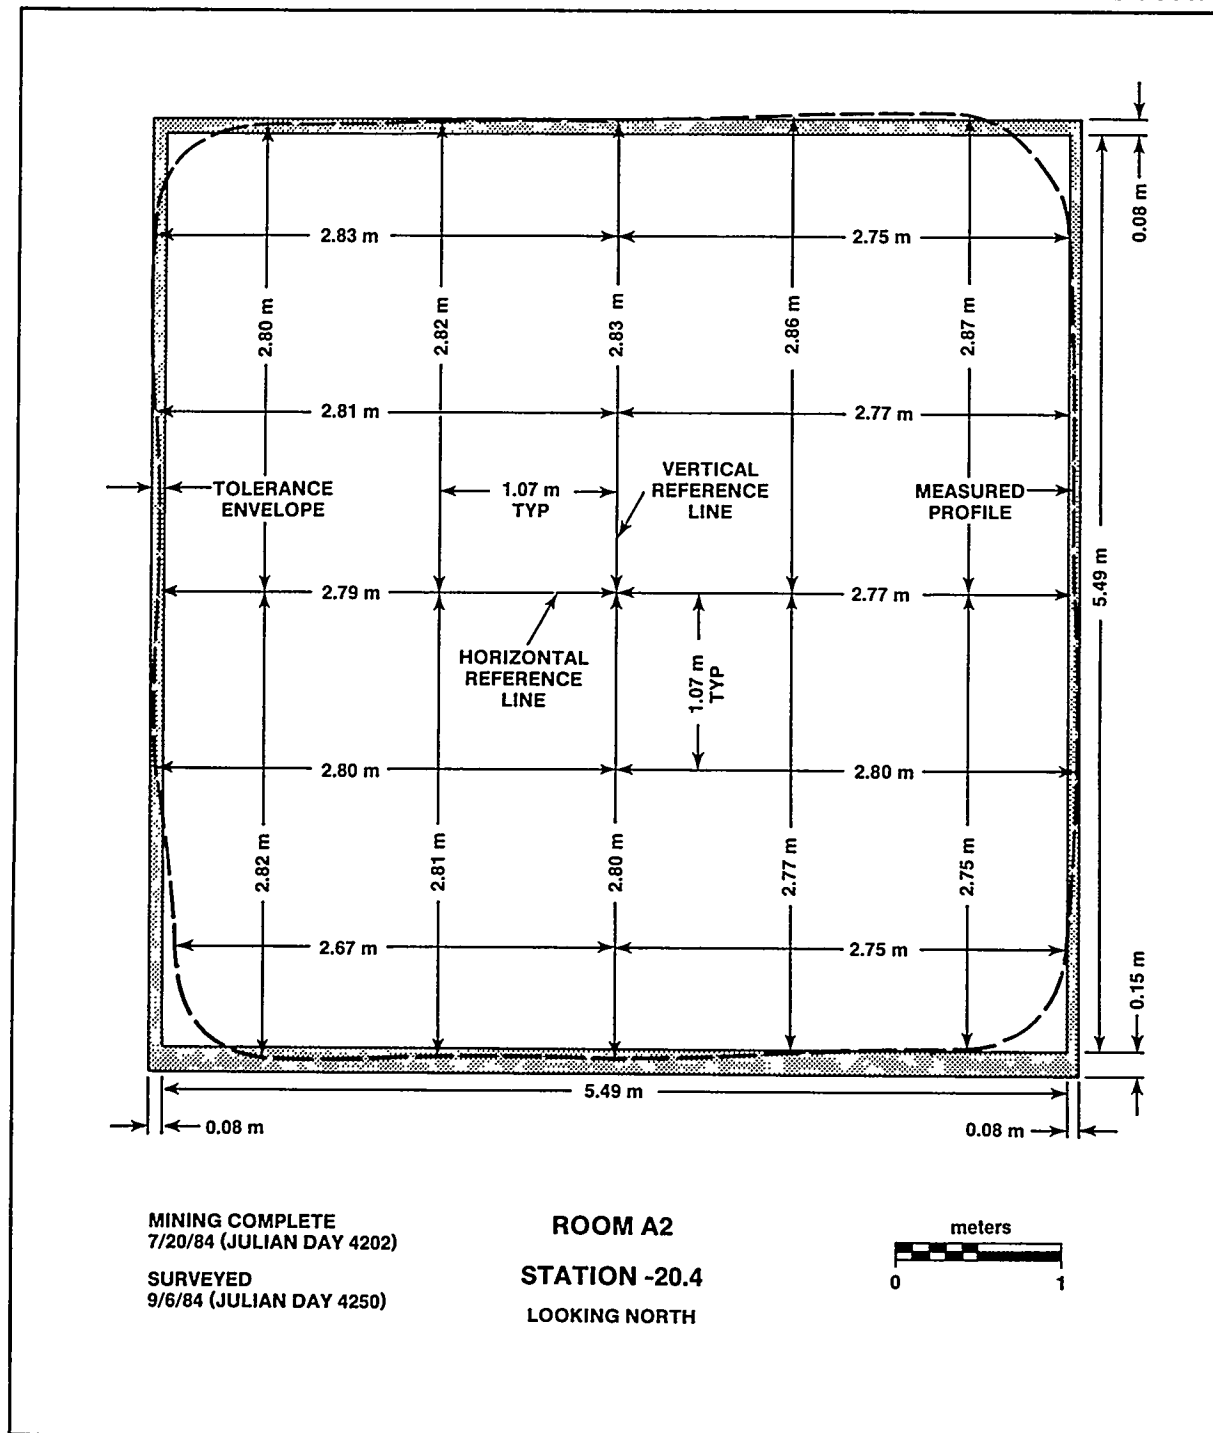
As-Built Cross Section of Station -20.4 m, Room A2
